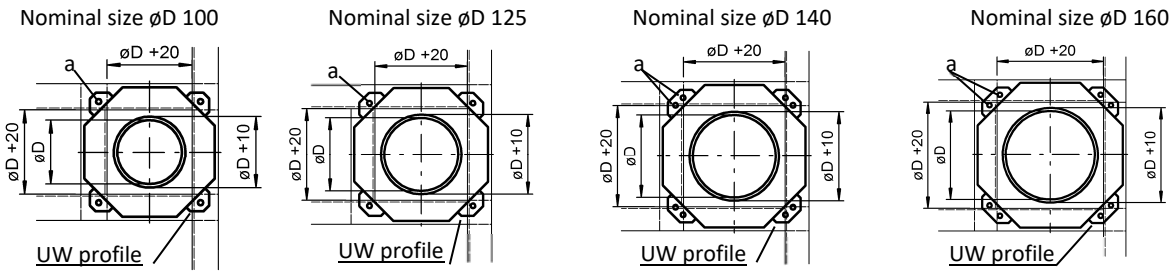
Dry installation on lightweight partition wall with mounting frame AR (F30/F60)
